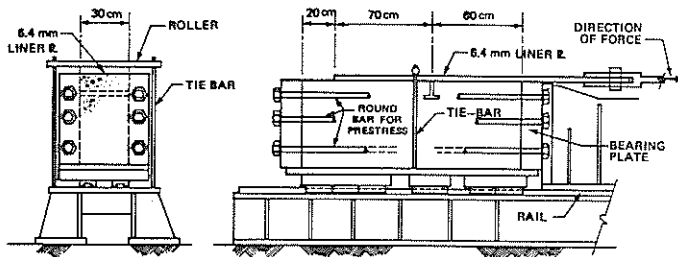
CHEAR TEST SPECIMEN AND TEST SET-UP
